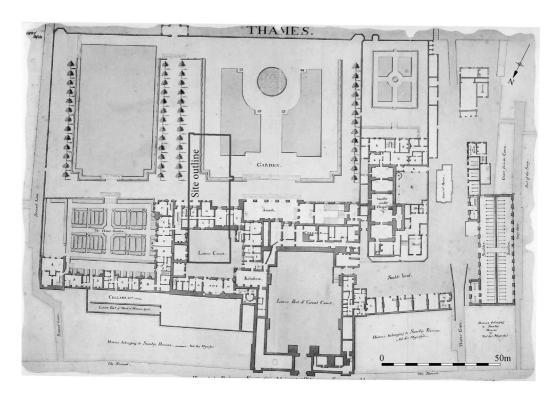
Kenton Couse's basement storey plan of Somerset Palace in 1775, showing the site location, north is towards the bottom of the plan (The National Archives, ref WORK30/260)
